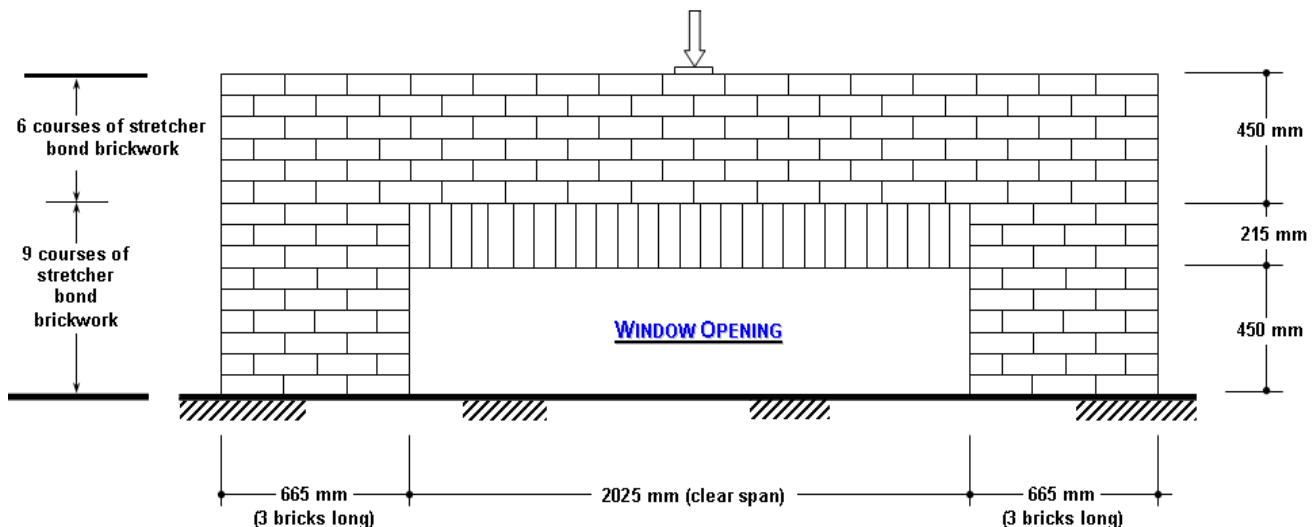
Typical masonry wall panel with 2.025m span opening tested in the laboratory
